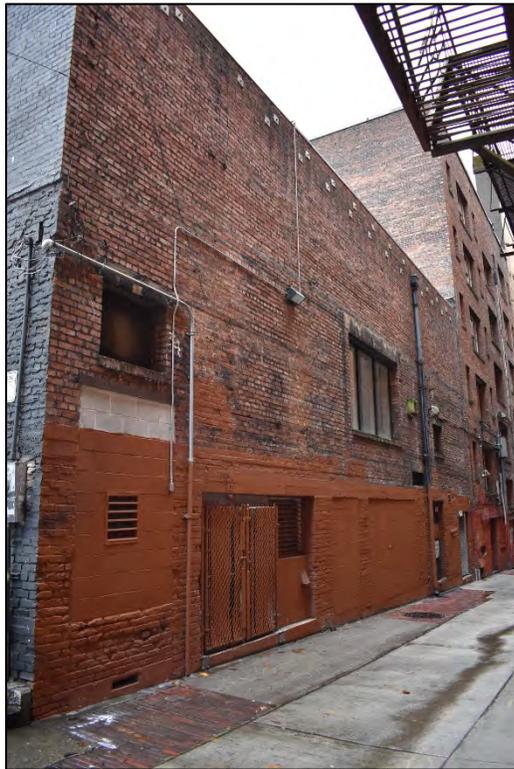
East elevation, detail typical window sash and sill at upper level
